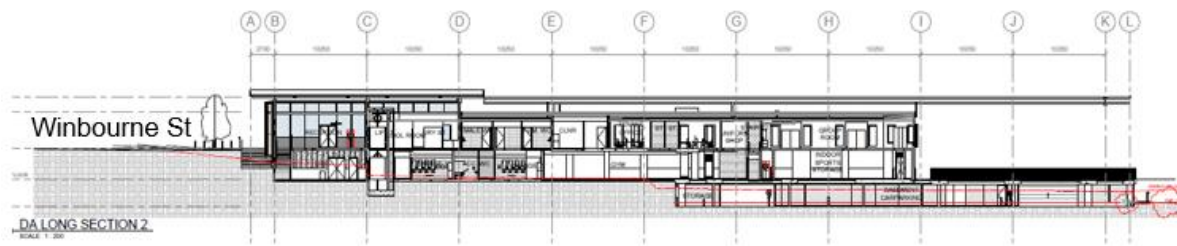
Extract of the Long Section 2 Plan which demonstrates the building mass stepping down with the slope of the land (the existing ground level is shown in red).
